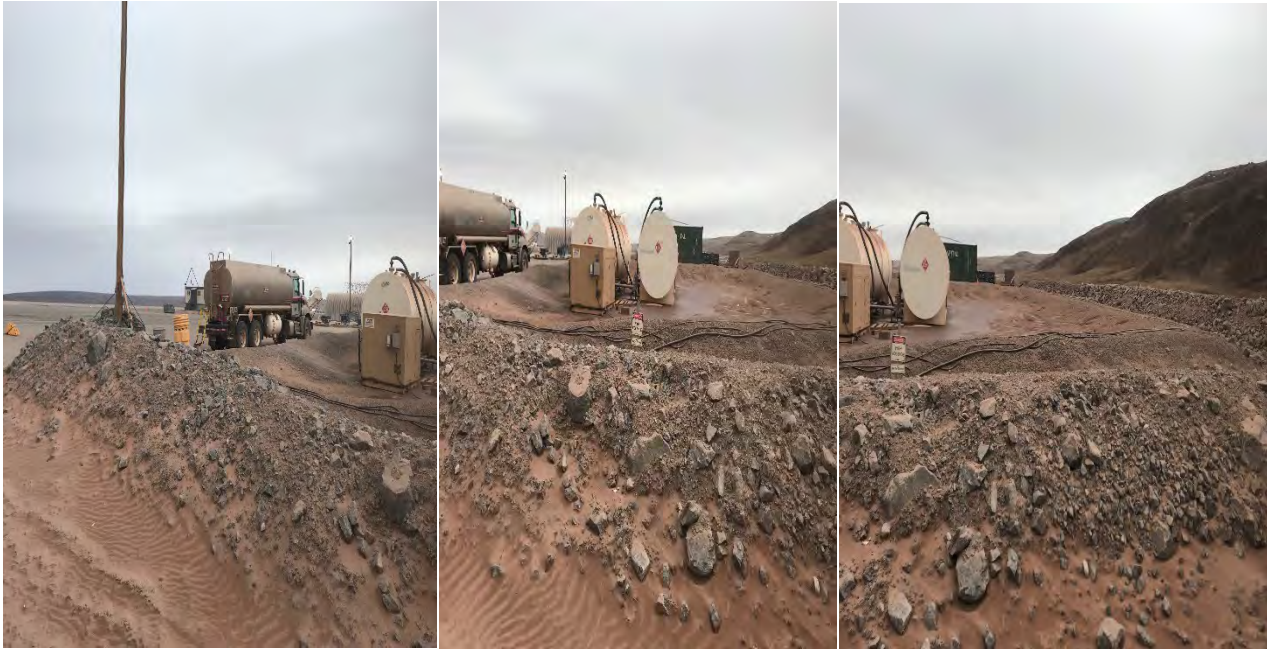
Site Reconnaissance at Airport Fuel Storage Berm, facing west. September 27, 2021
